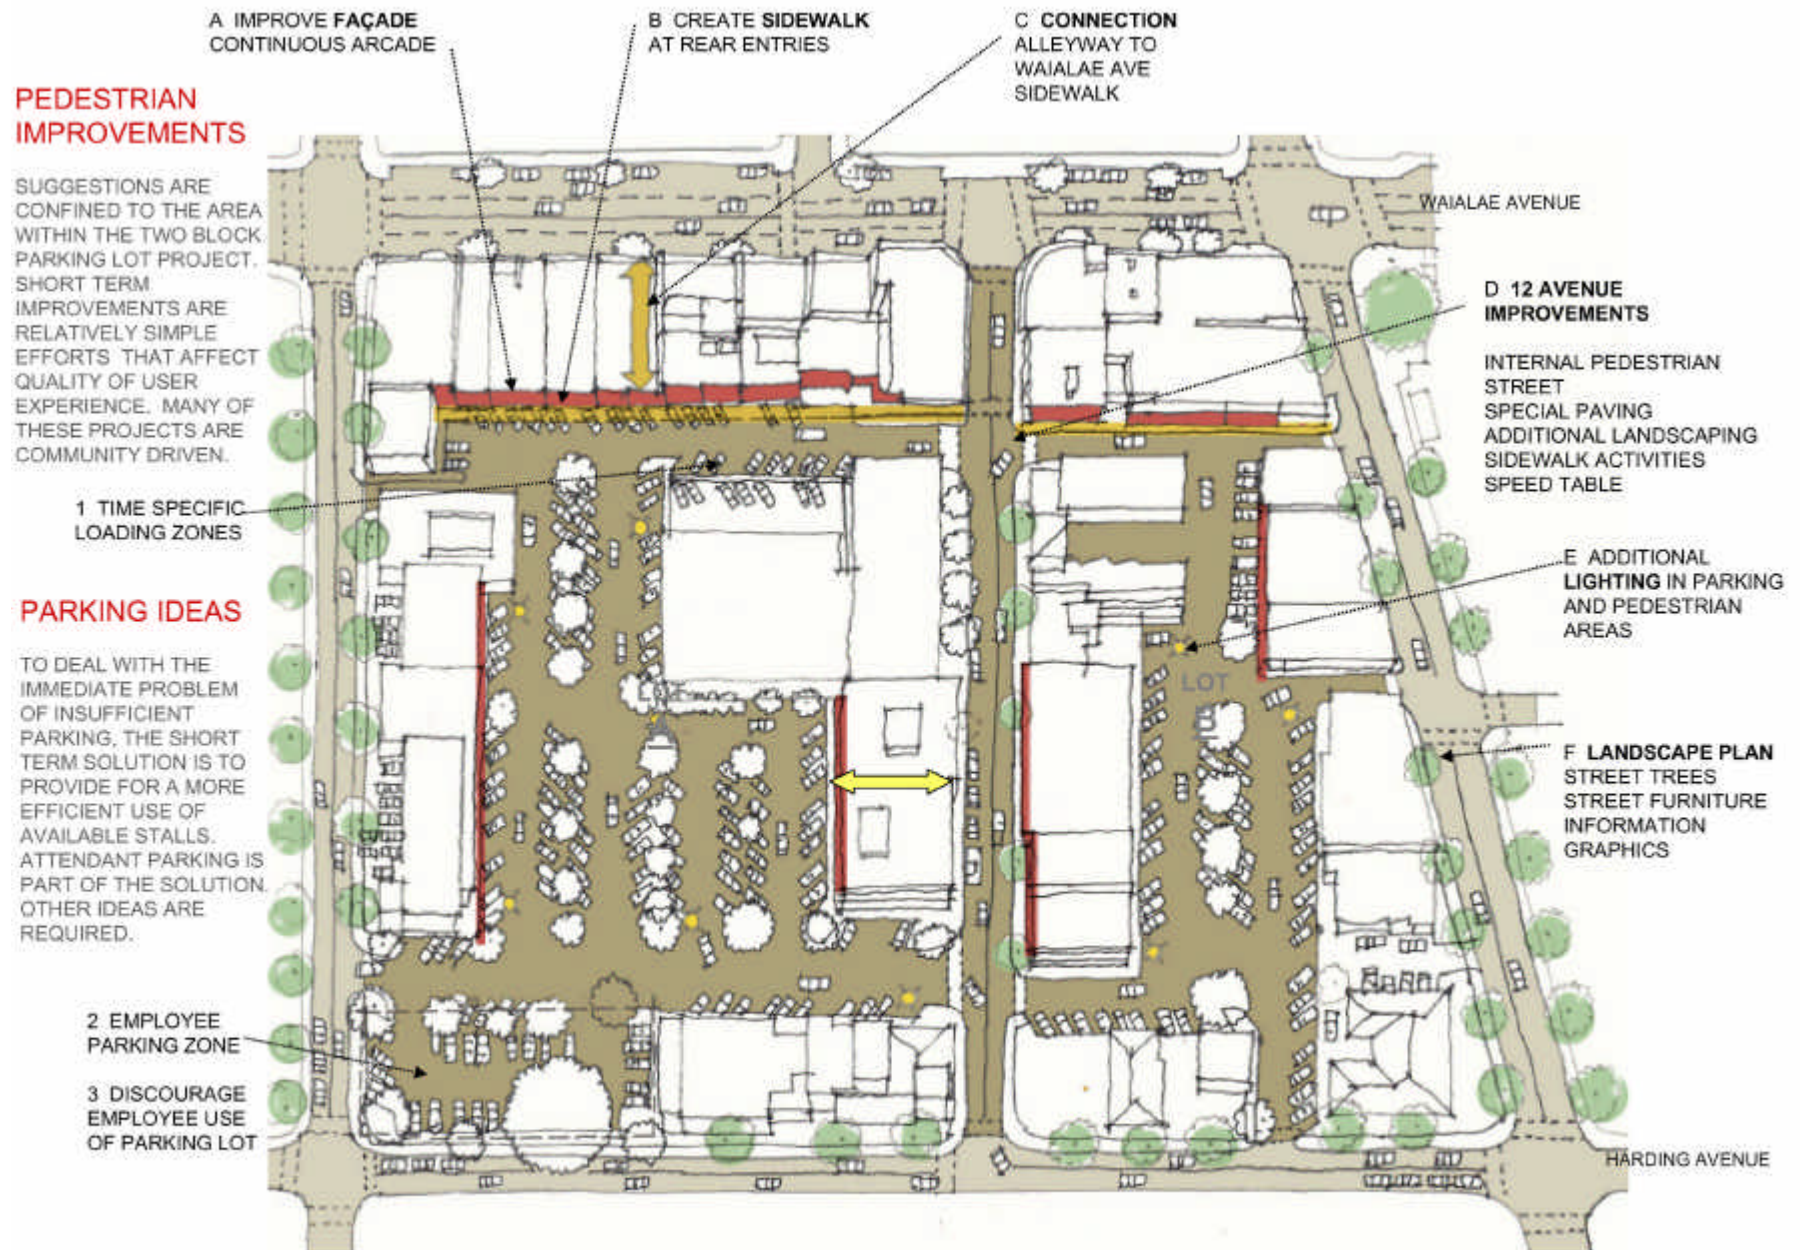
Illustrative Site Plan of Other Short-Term Improvements
